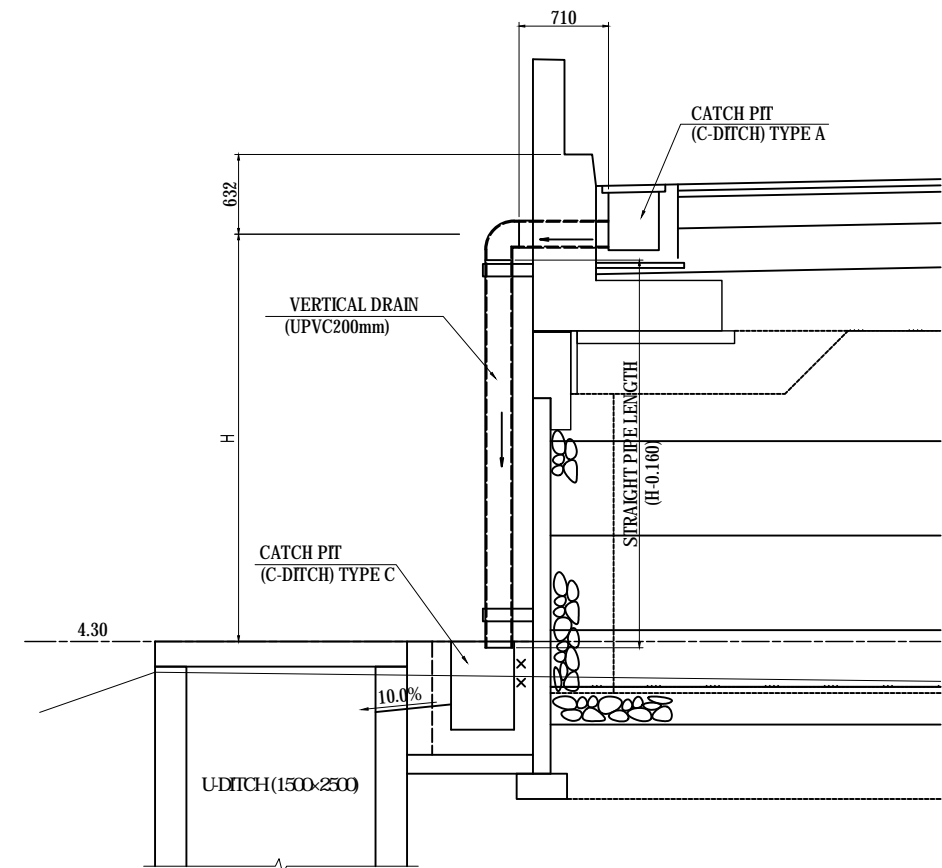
DETAIL OF CATCH PIT (C-DITCH) TYPE A S=1:20
